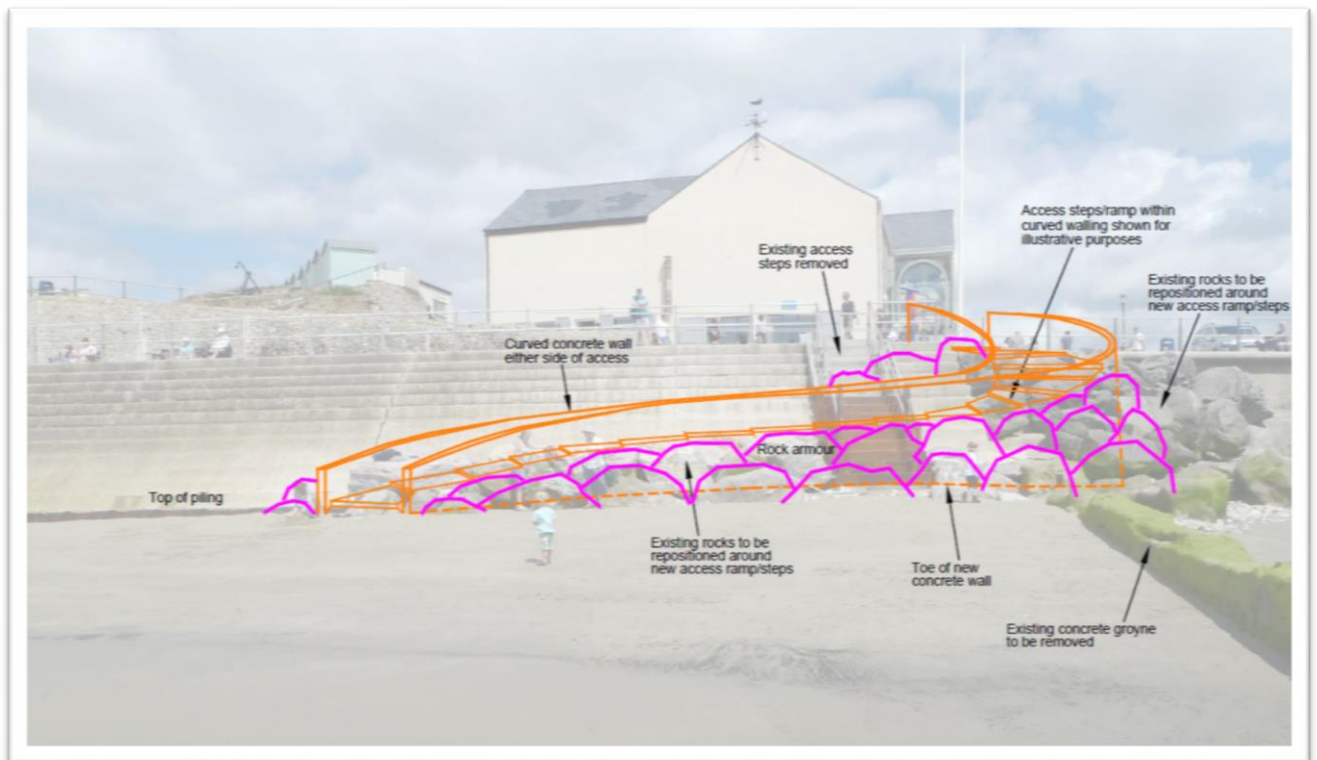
Schematic View of the Proposed Beach Stepped Access Ramp from the Sea
